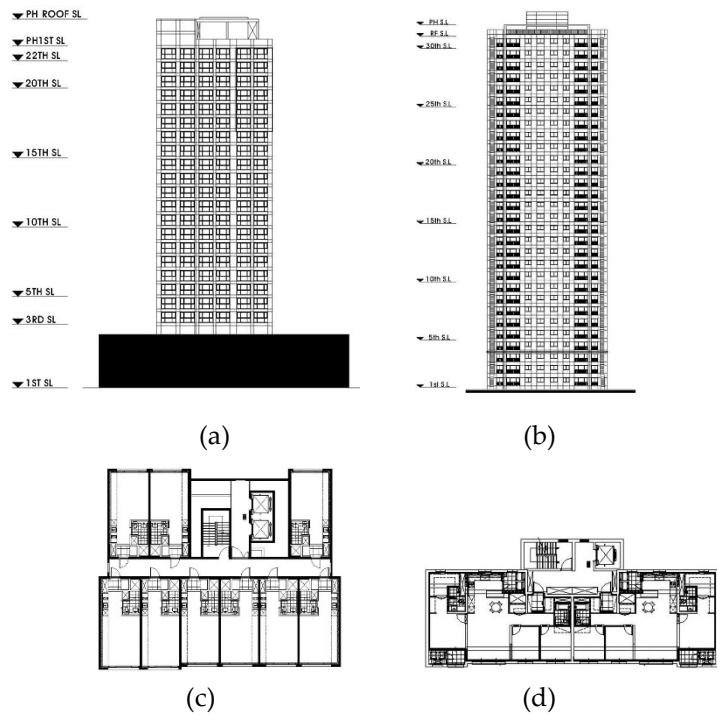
Target buildings: (a) Building A's elevation; (b) Building B's elevation; (c) Building A's floor plan; (d) Building B's floor plan.
